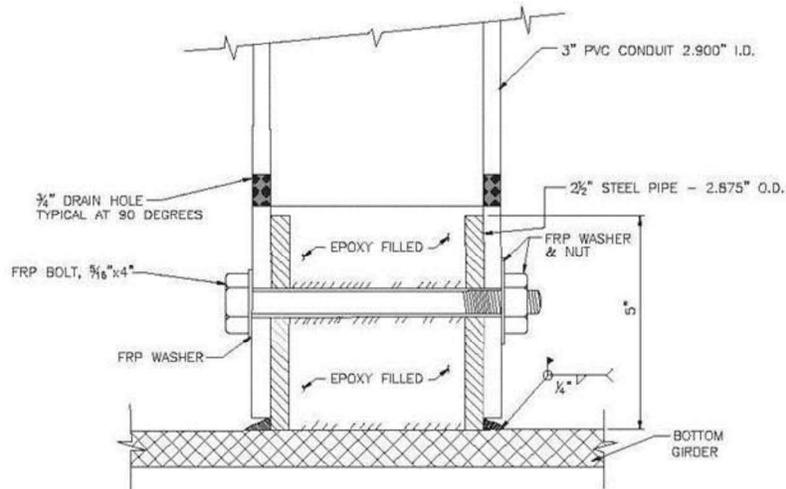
Anode Protection Pipe Bottom Girder Termination
